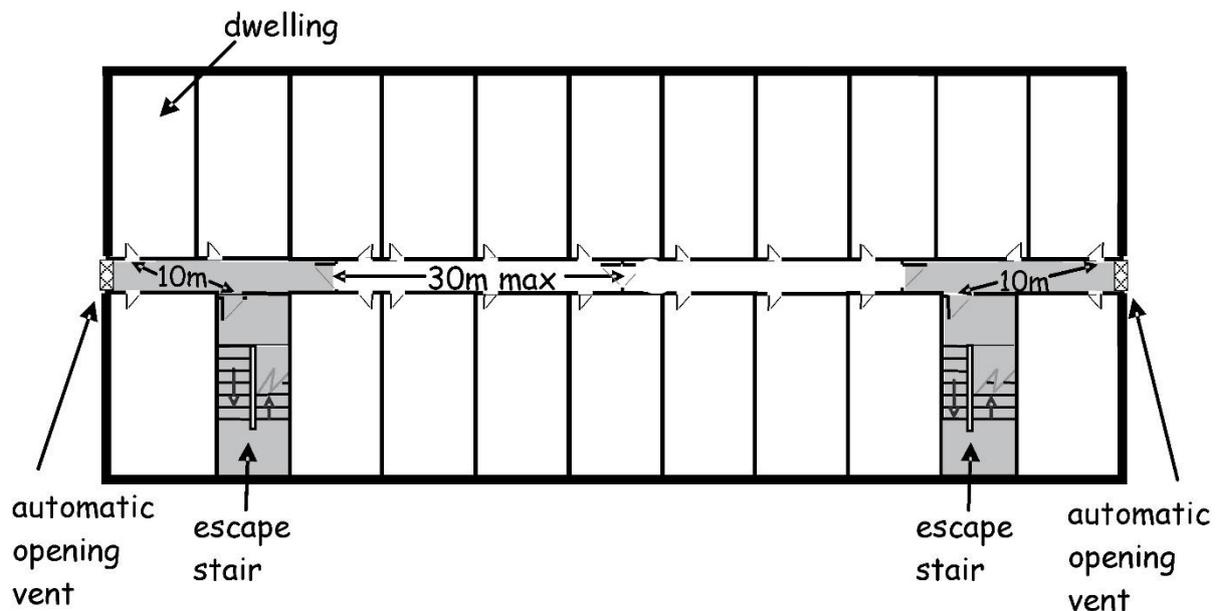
Upper floor arrangement where flats are served by more than one escape stairway and there are dead ends
